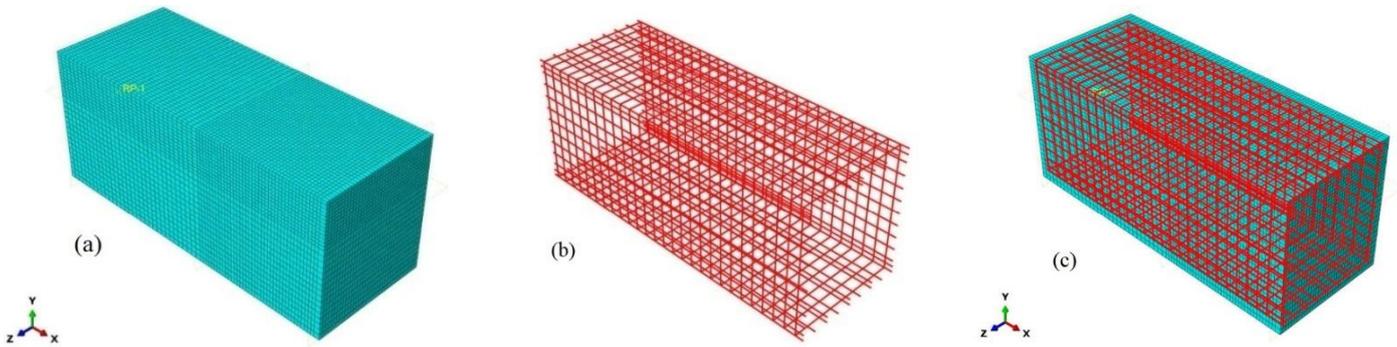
FE model of (a) concrete girder (b) reinforcement (c) assembled girder and reinforcement.
